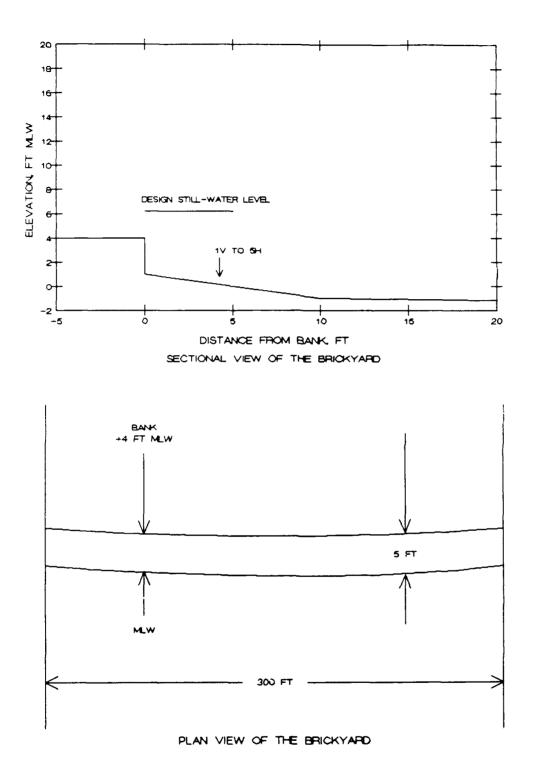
SECTIONAL AND PLAN VIEWS OF THE BRICKYARD
